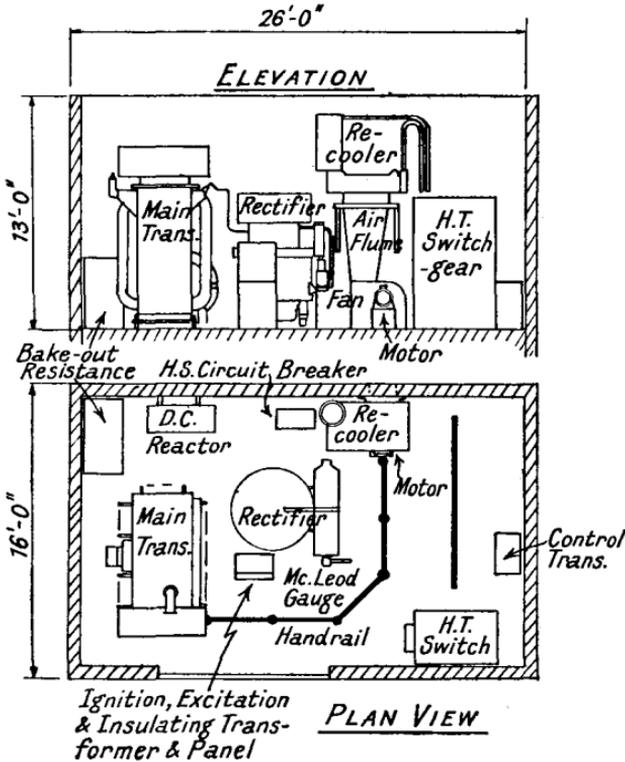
A typical modern industrial steel tank rectifier sub-station layout (B. T-H.)
